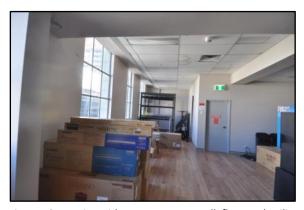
Interior with contemporary wall, floor and ceiling finishes and bulkheads of former rooms below caretakers flat. Original steel windows.
